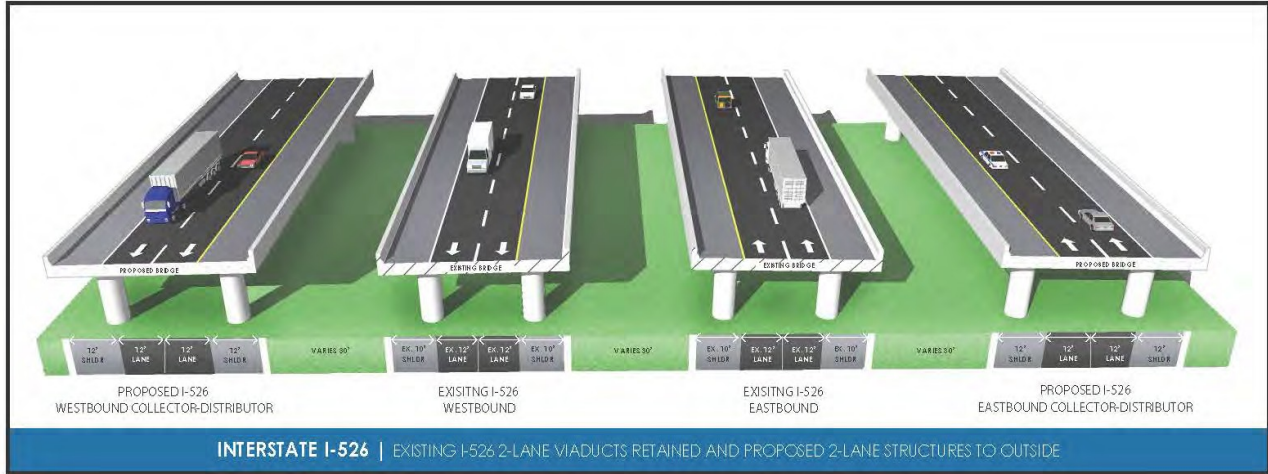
Typical Section of Improvements and New Viaduct Over Filbin Creek
